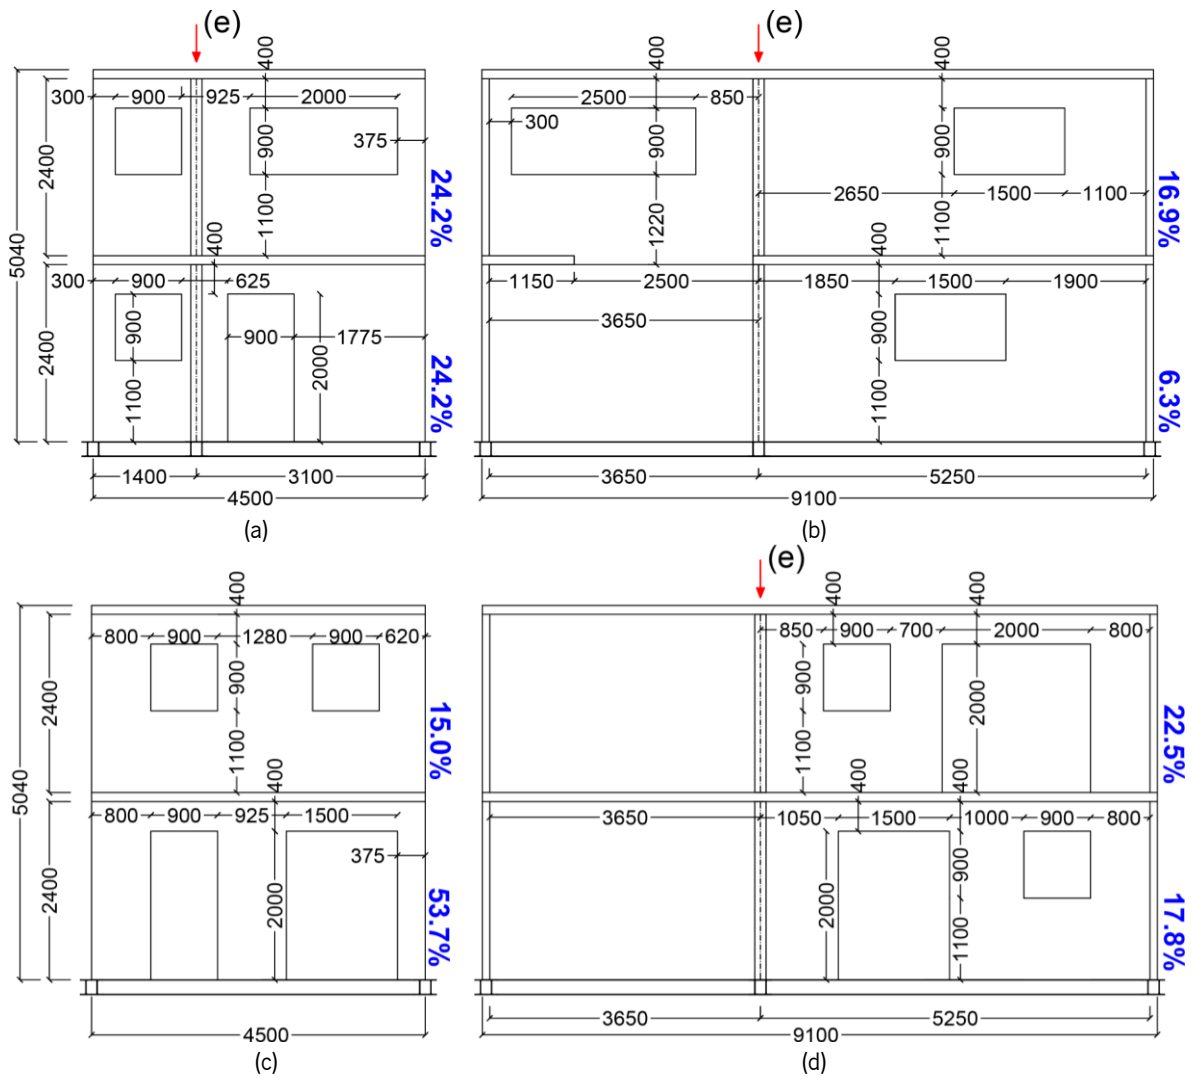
Building façades (dimensions in mm): (a) façade A-A'; (b) façade C-C'; (c) façade B-B'; (d) façade D-D'; (e) spline joint with LVL. (note that the plotted percentage values concern the relative area of the openings within each façade).
